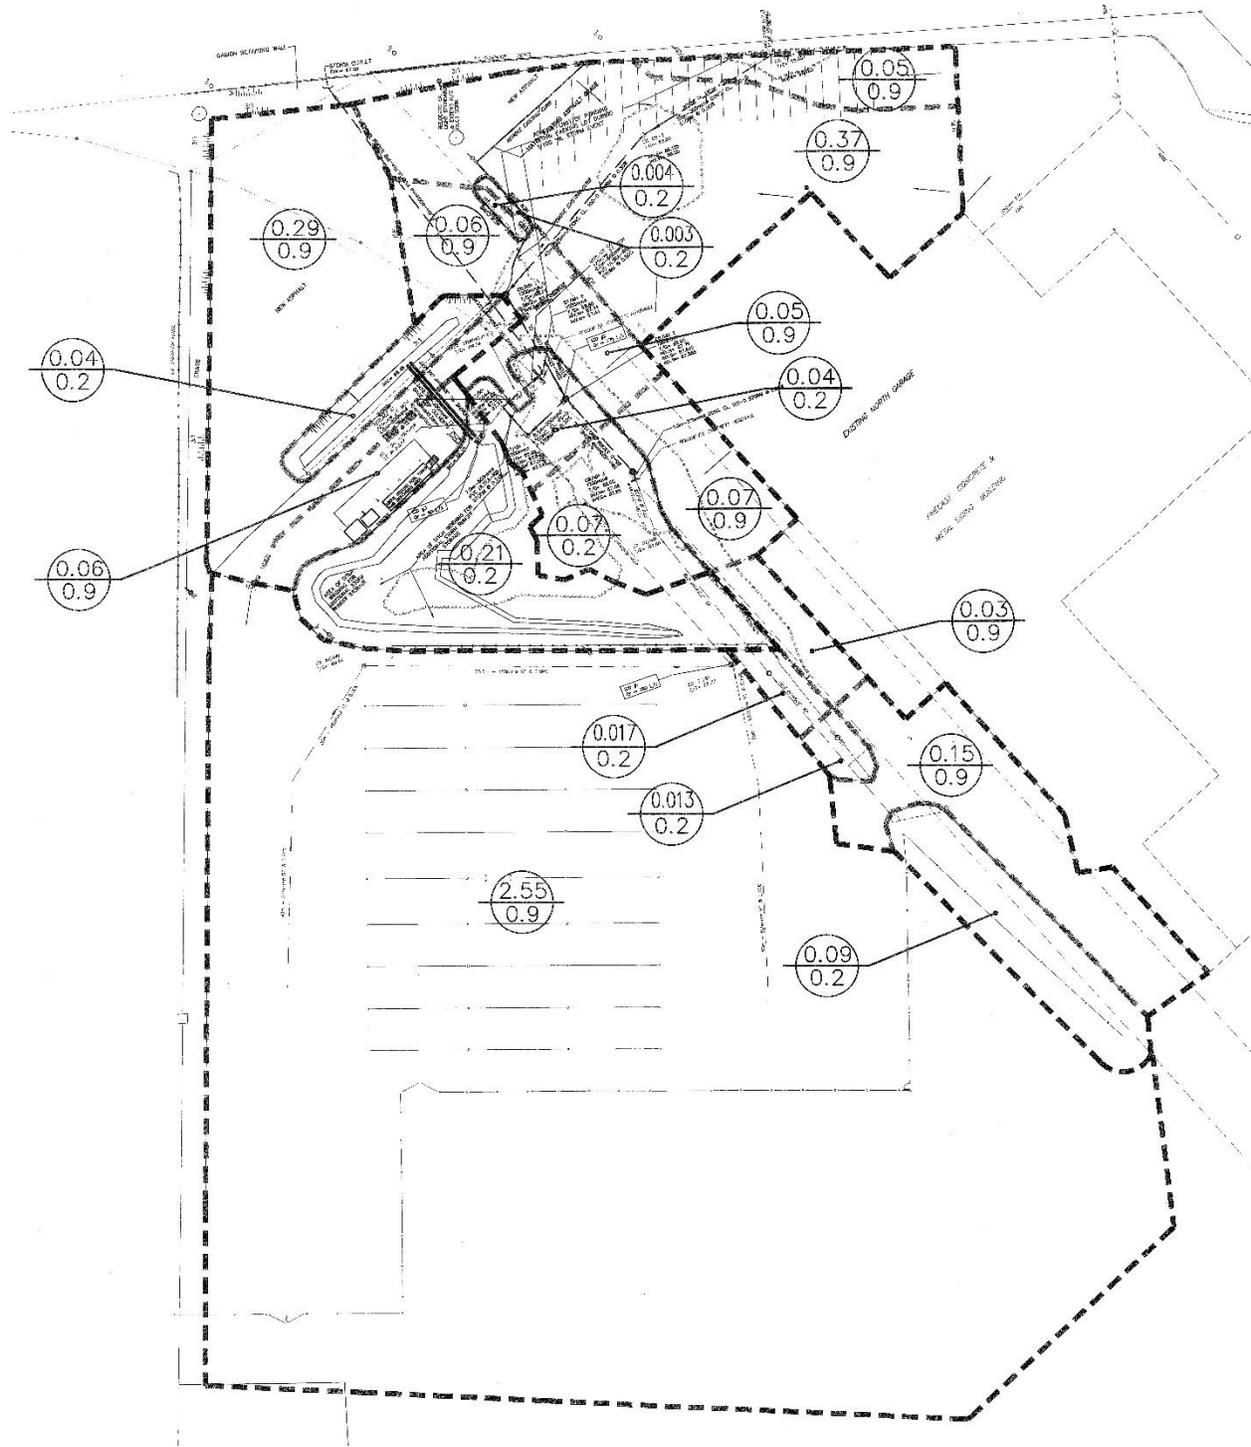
Site Plan and Storm Sewer Layout from 2006
